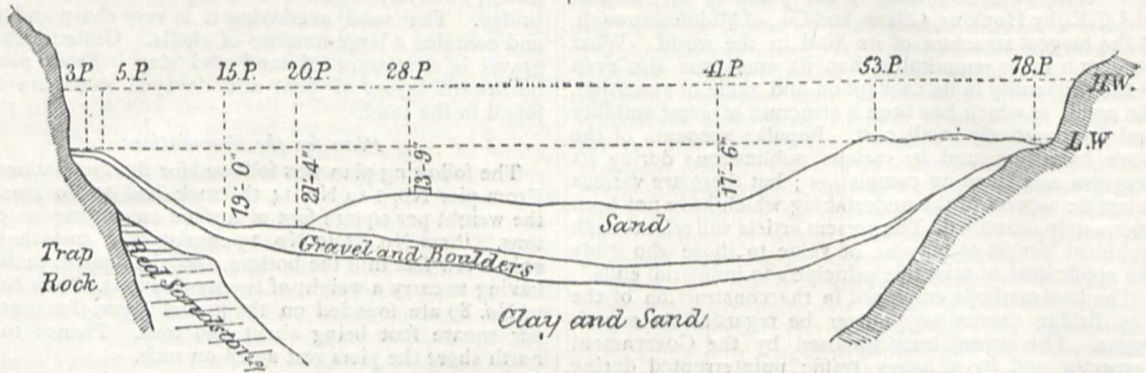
Section of river. Horizontal scale 2,000 feet to 1 inch. Vertical scale 50 feet to 1 inch.
